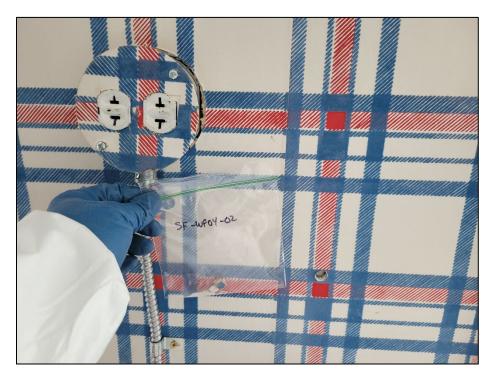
WP04: Drywall behind the wallpaper containing 3% chrysotile ACM. Approximately 7,200 square feet of drywall walls are located on the first floor.
